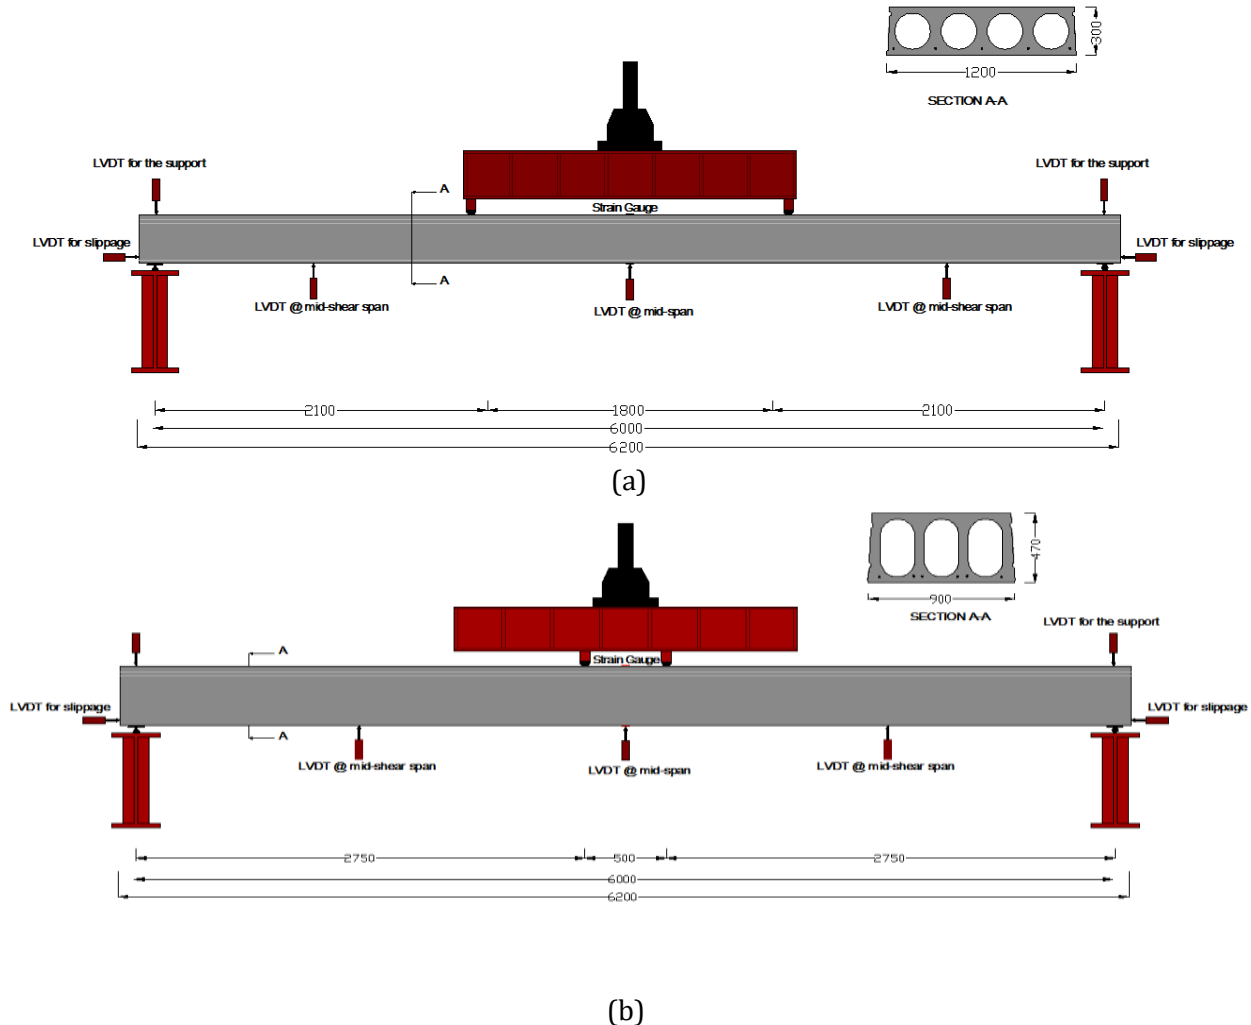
Typical test set-up elevation for HCS with depth (a) 300 mm and (b) 470 mm.
